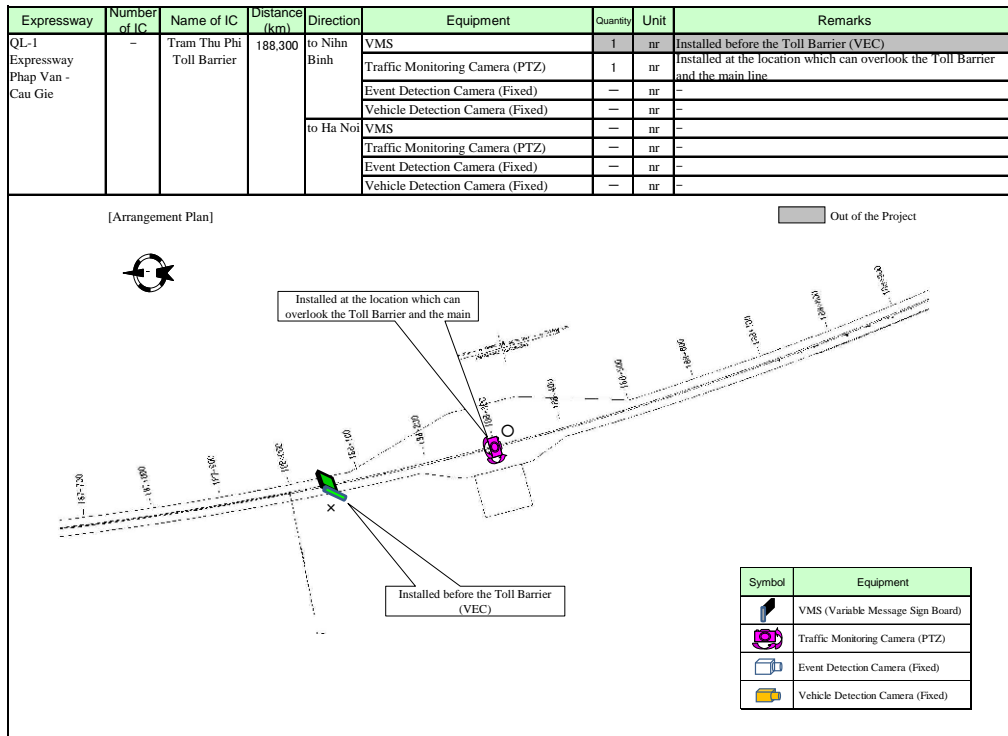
Equipment Layout Plan at Tram Thu Phi Toll Gate
